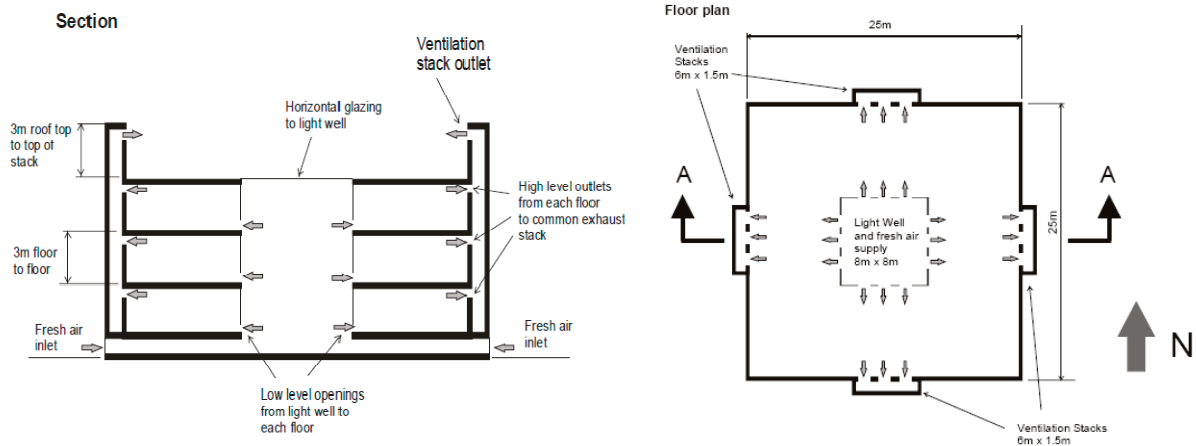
a) Section view of building A; b) A typical floor plan view of building A
